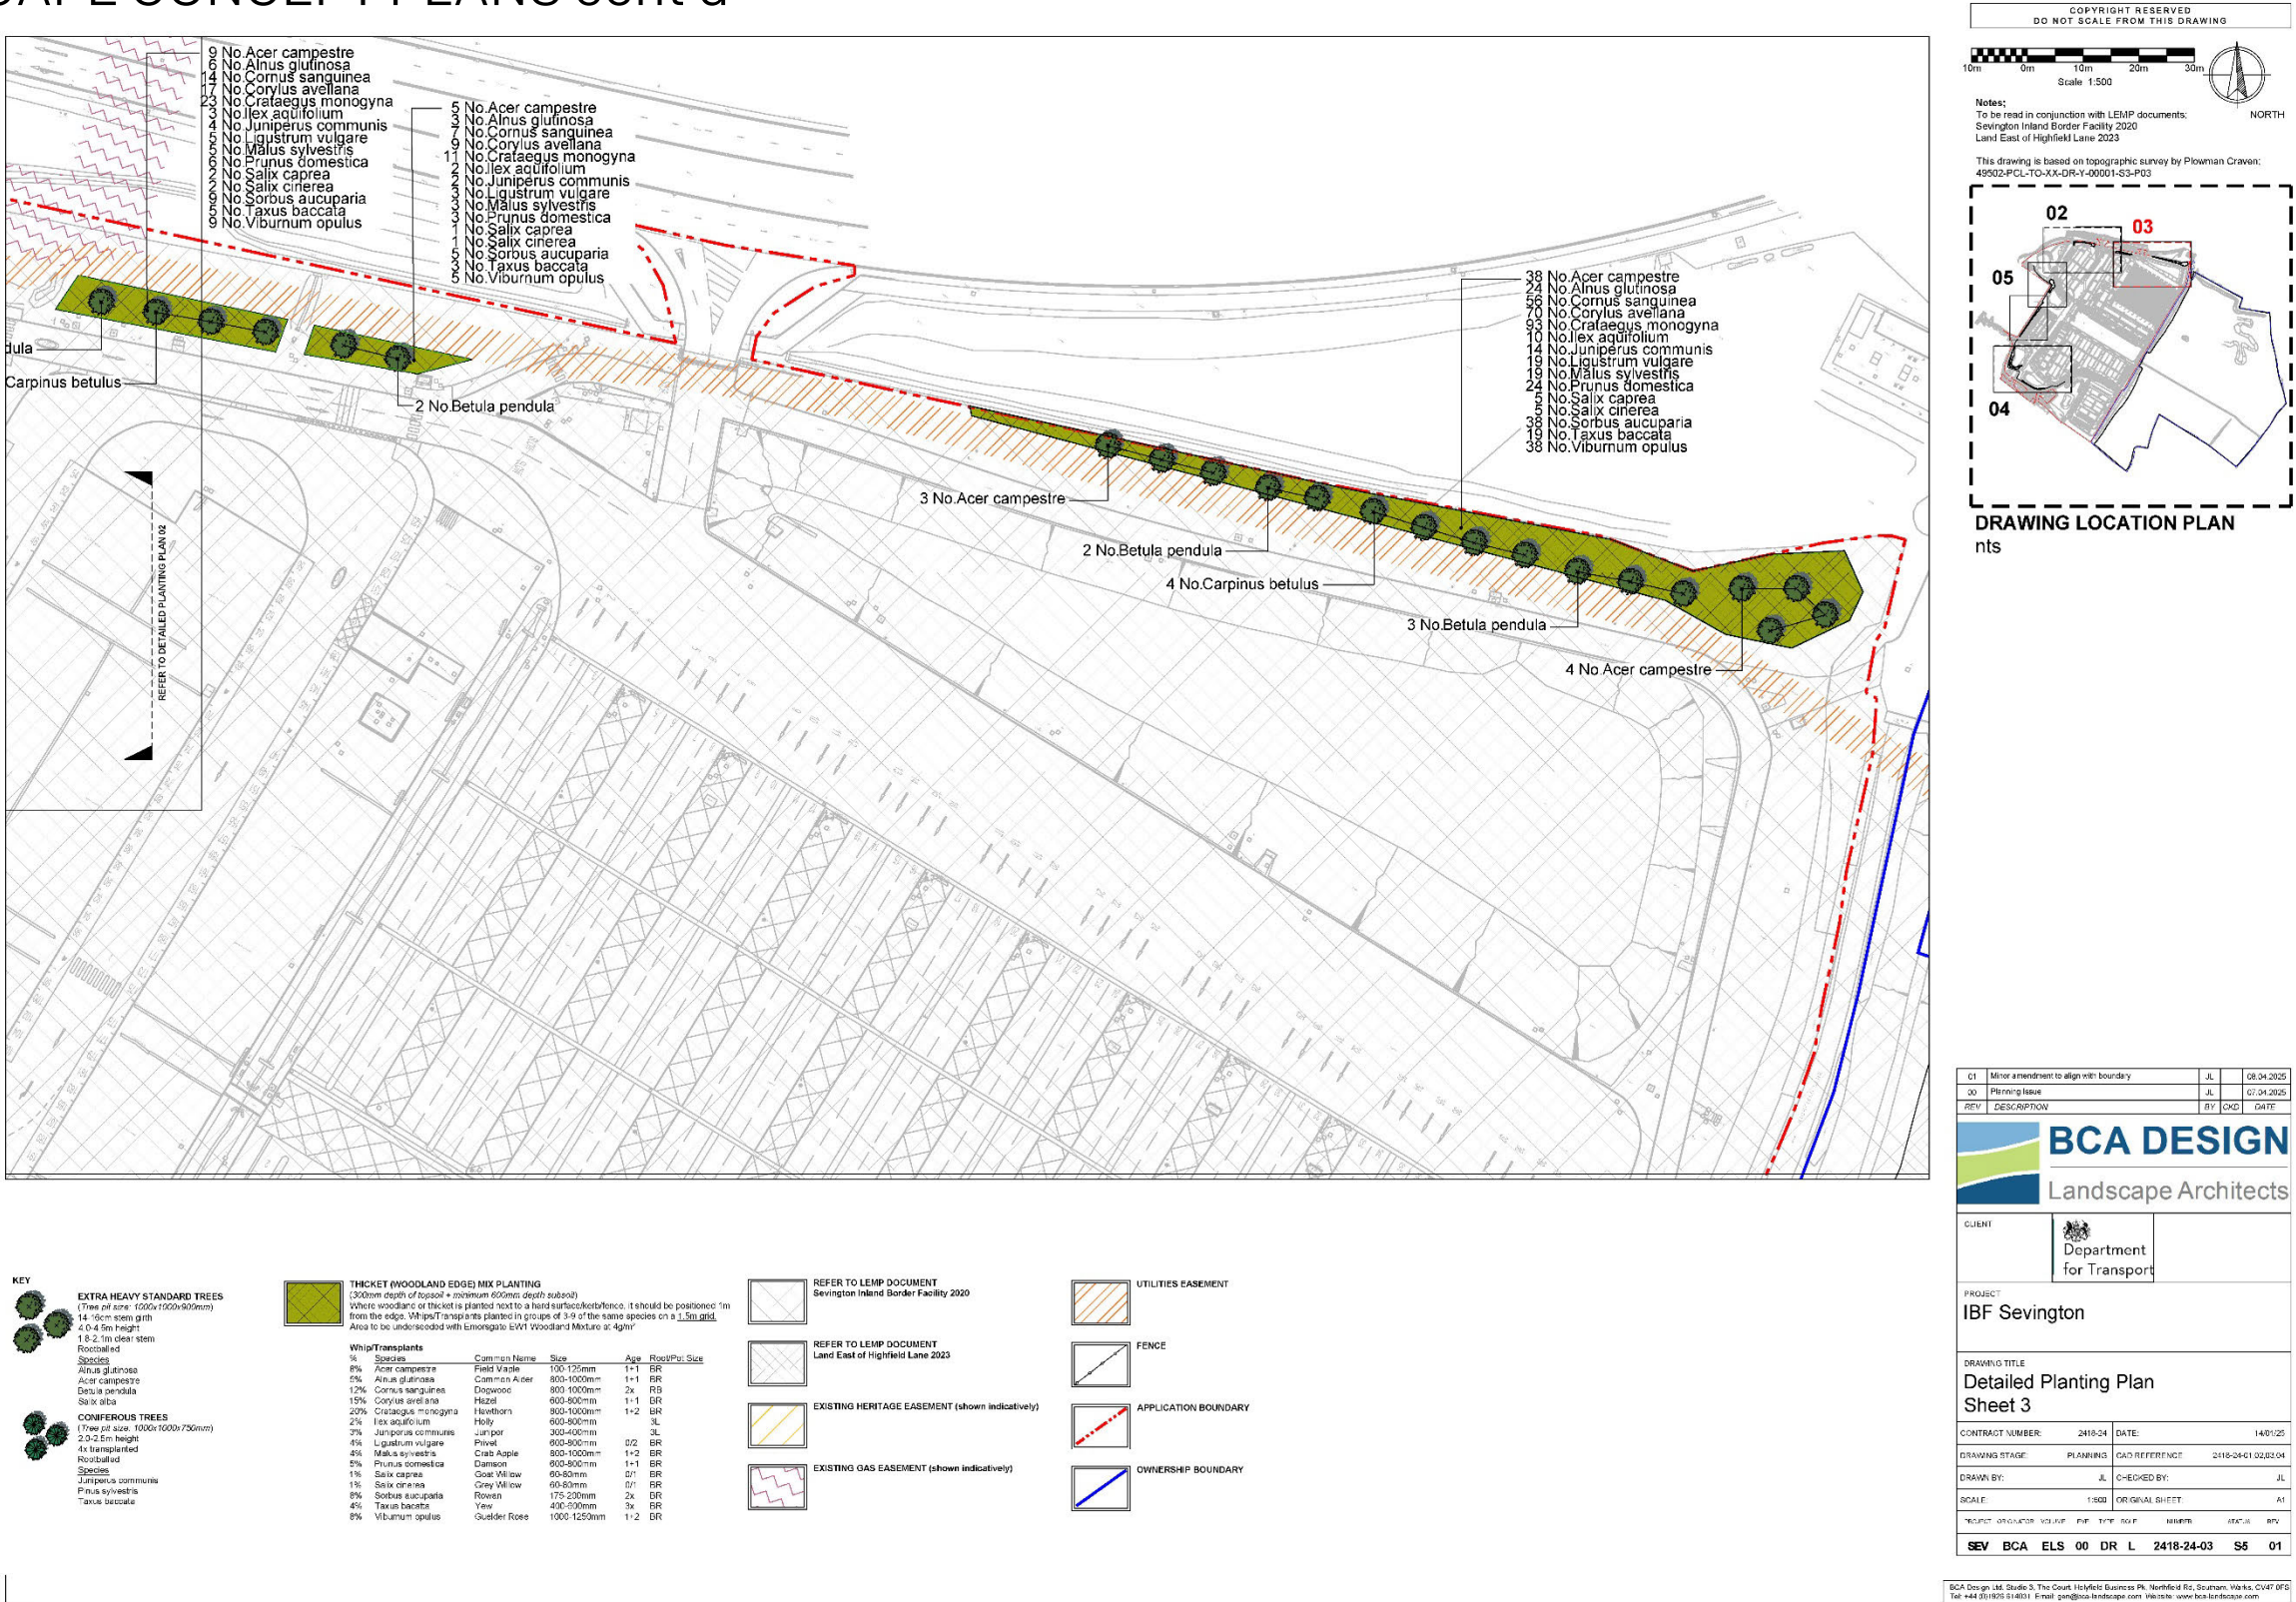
2418-24-03.Rev 01 Landscape Detailed Planting Plan Sheet 3
